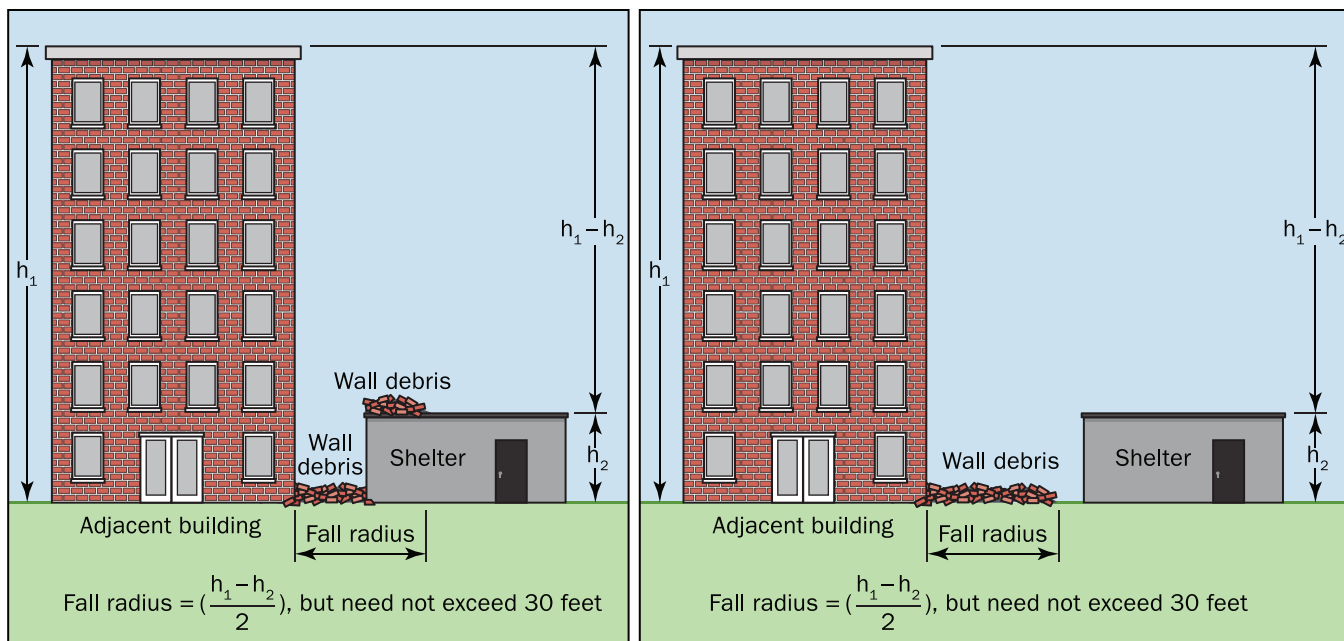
Falling debris fall radius (if the indicated safe room was sited any closer to the adjacent building, then falling debris impact loading would be required)
